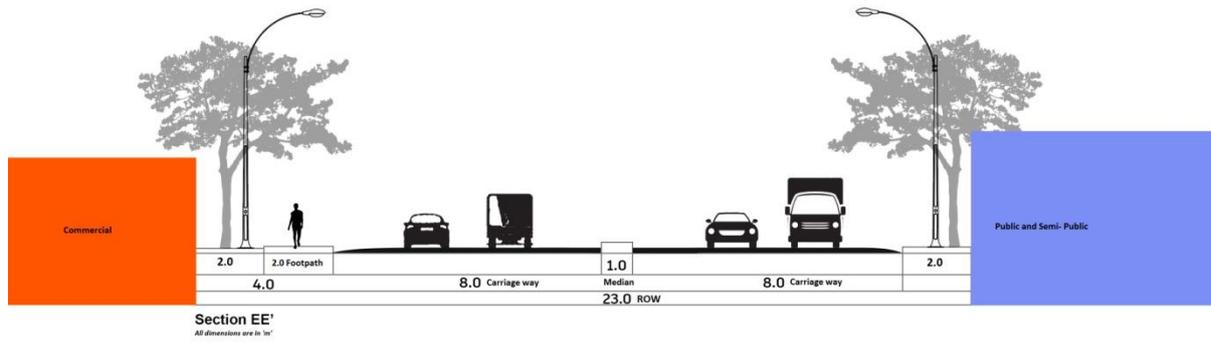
2: Selected sub-arterial road cross sections in Greater Imphal Planning Area
